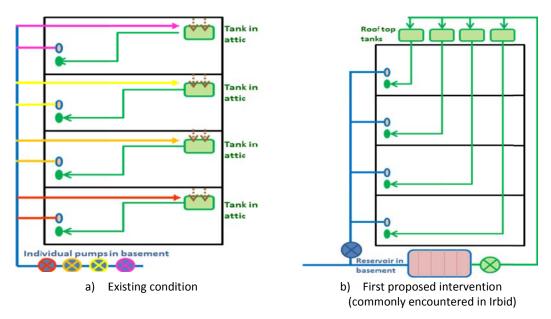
Existing water supply conditions in Tebbaneh and the first proposed intervention
